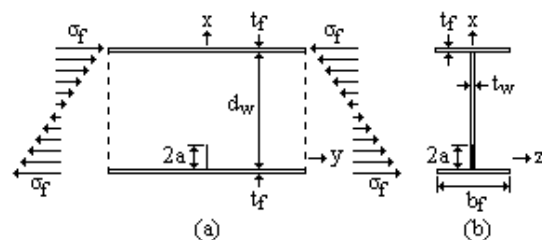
(a) I-shaped plate girder loaded under pure bending and (b) section through edge-crack
